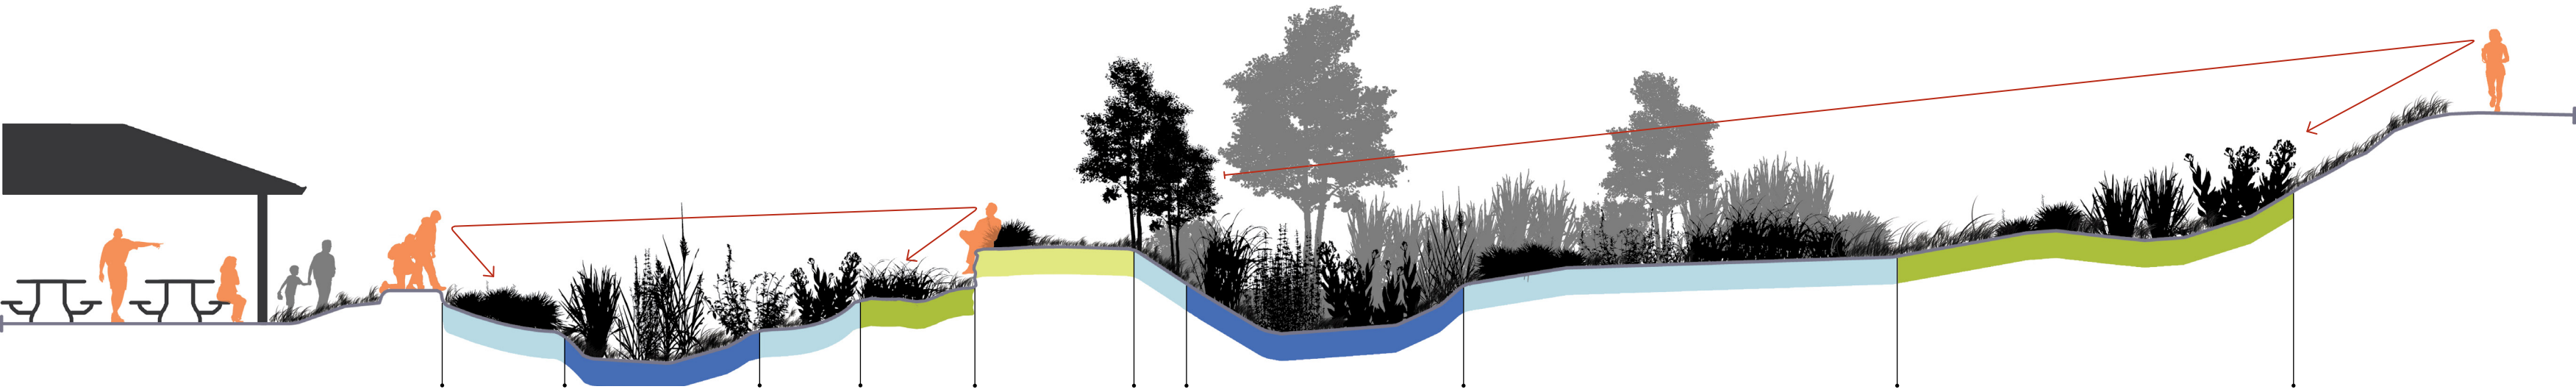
Top: SMS Alternate 4, Bioretention system section facing west.
